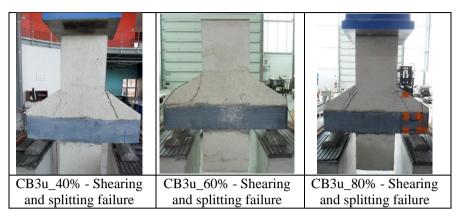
Failure modes of repaired strengthened reinforced-concrete corbels
